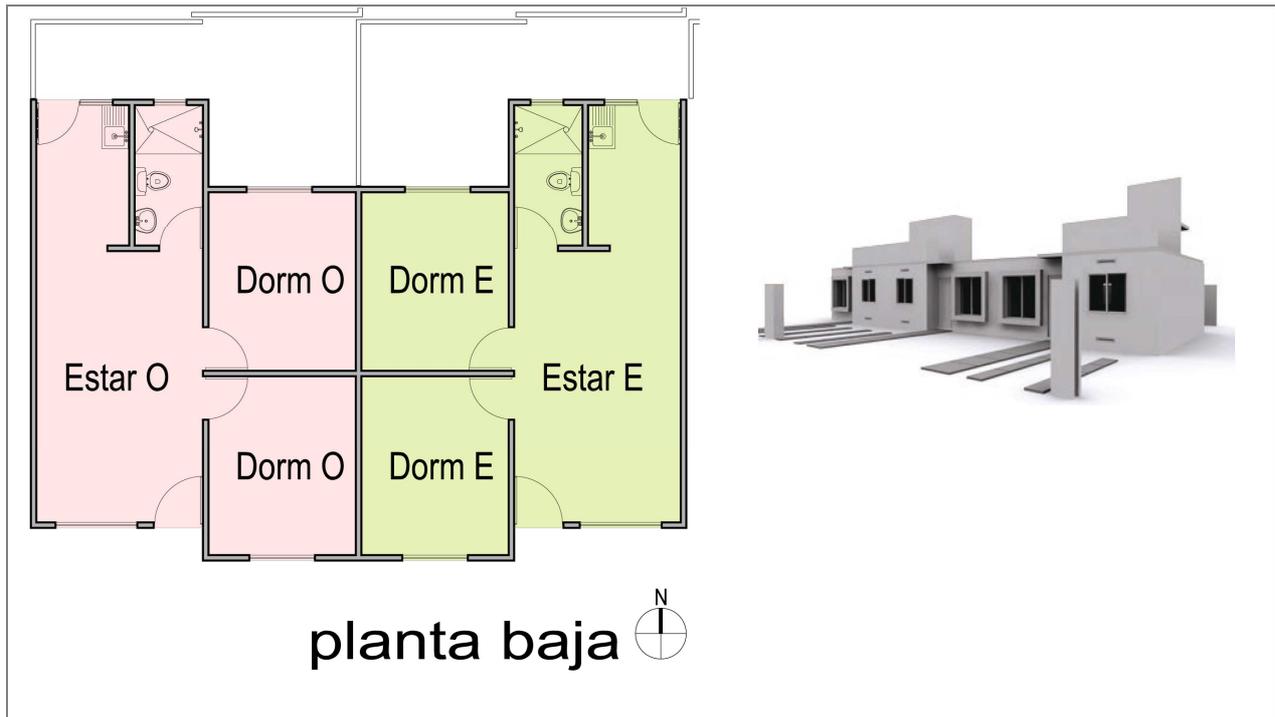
Adosada building type. Floor plan and 3D model, no scale
